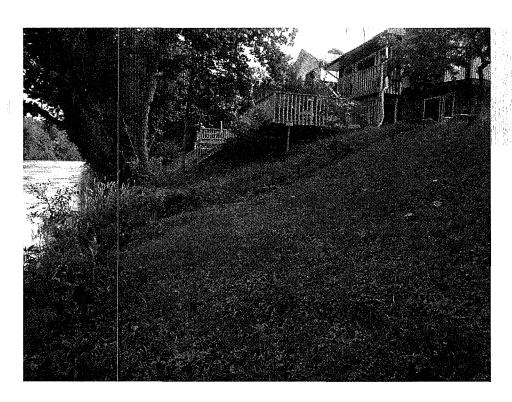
Riverward slope of levee and crest looking north (Station 28+80)
